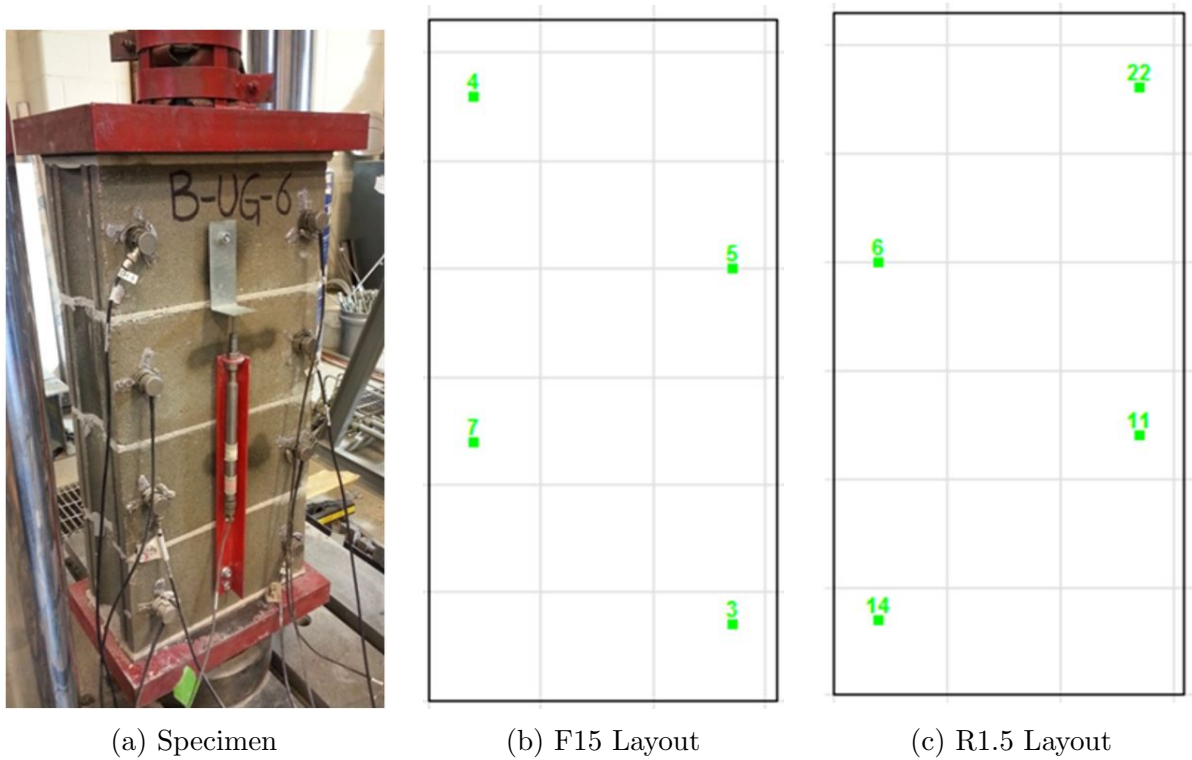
Sensor layouts and test setups of masonry prism tests
